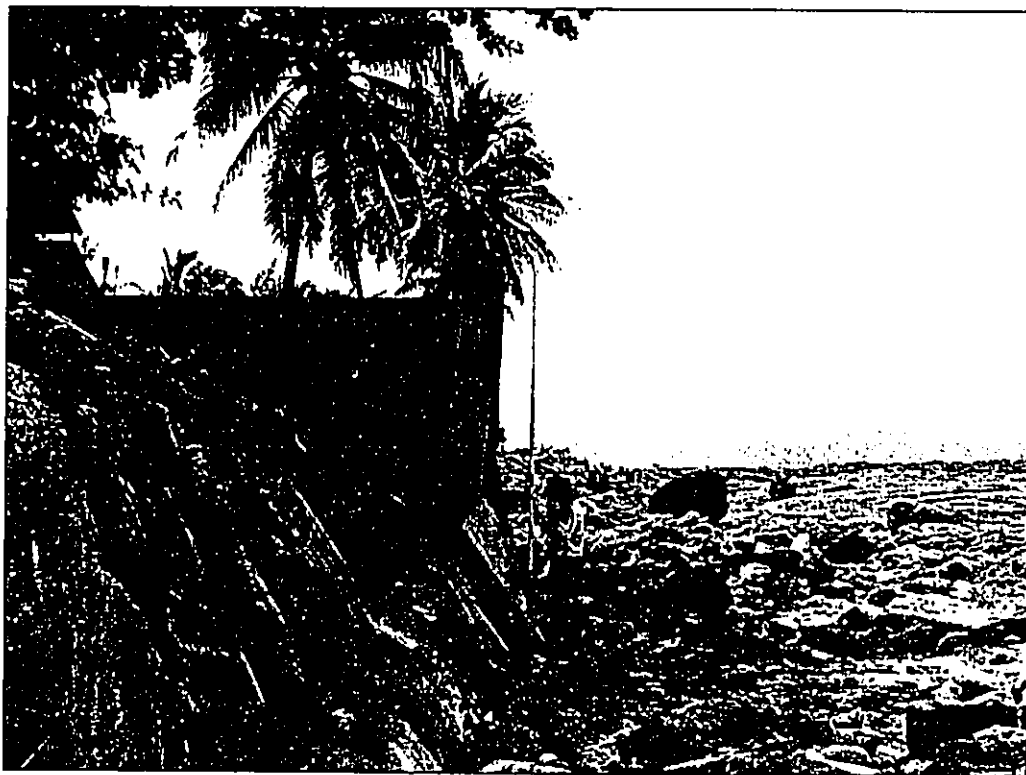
Collapsed wall at 59-601 Ke Iki Rd. Survey rod in Figure 6 is 12.5 ft. high.
